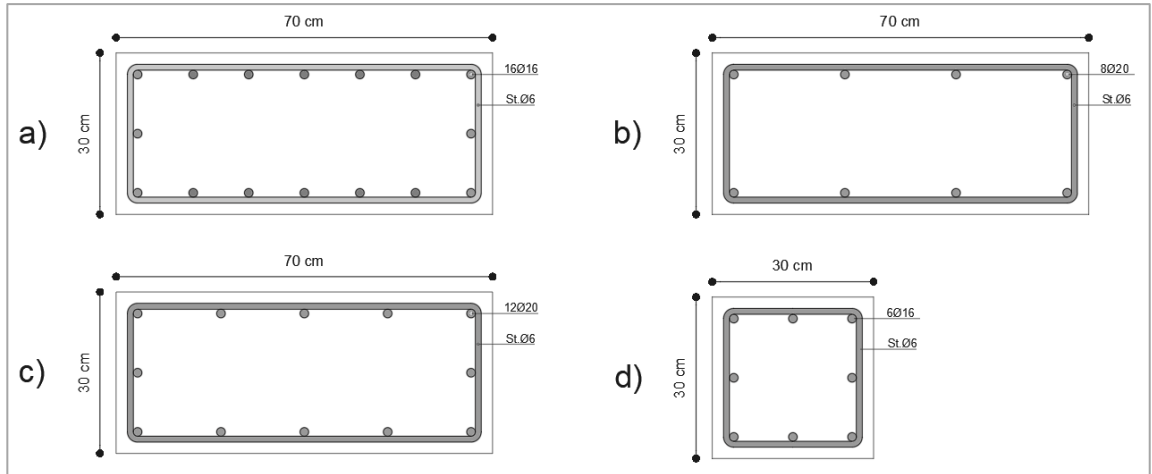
Column type “C – 1b” reinforcement details, a) used in floor 1-4, b) used in floor 5, c) used in floor 6 and d) used in floor 7 of E Template (Durrës) building
